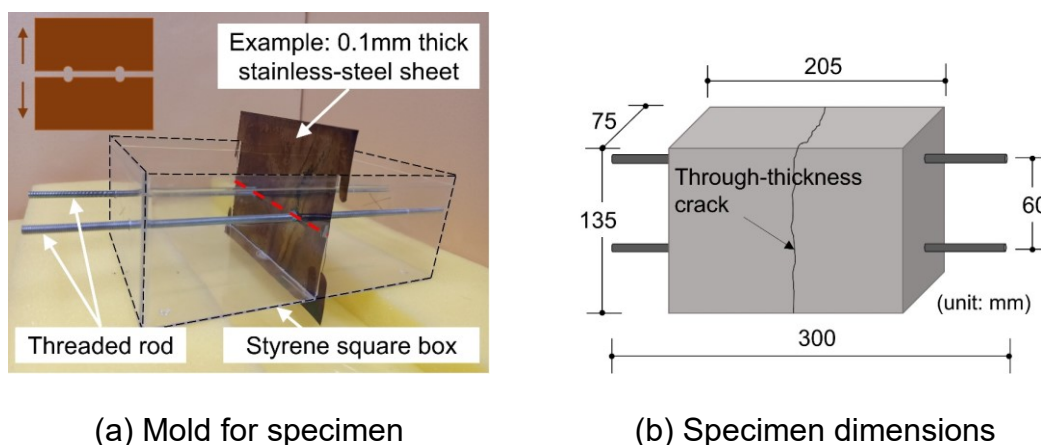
Mold for making through-thickness crack specimens and dimensions of experimental specimens.
